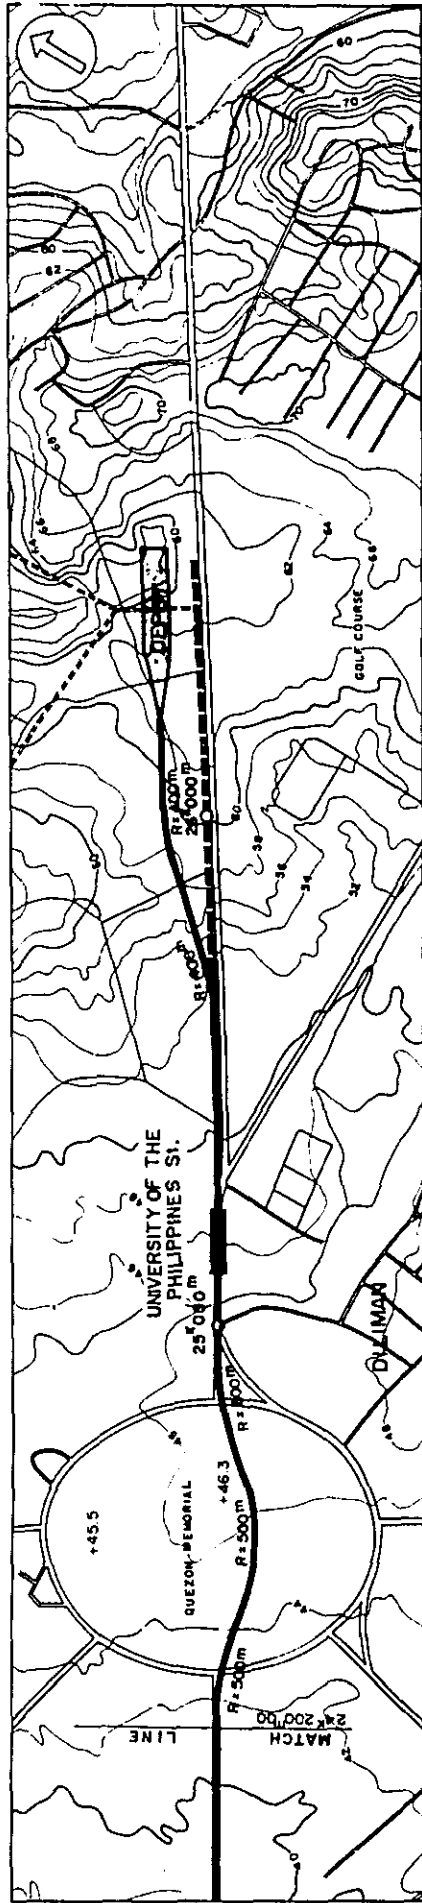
Plan and Profile for All Underground Alternative (2)
